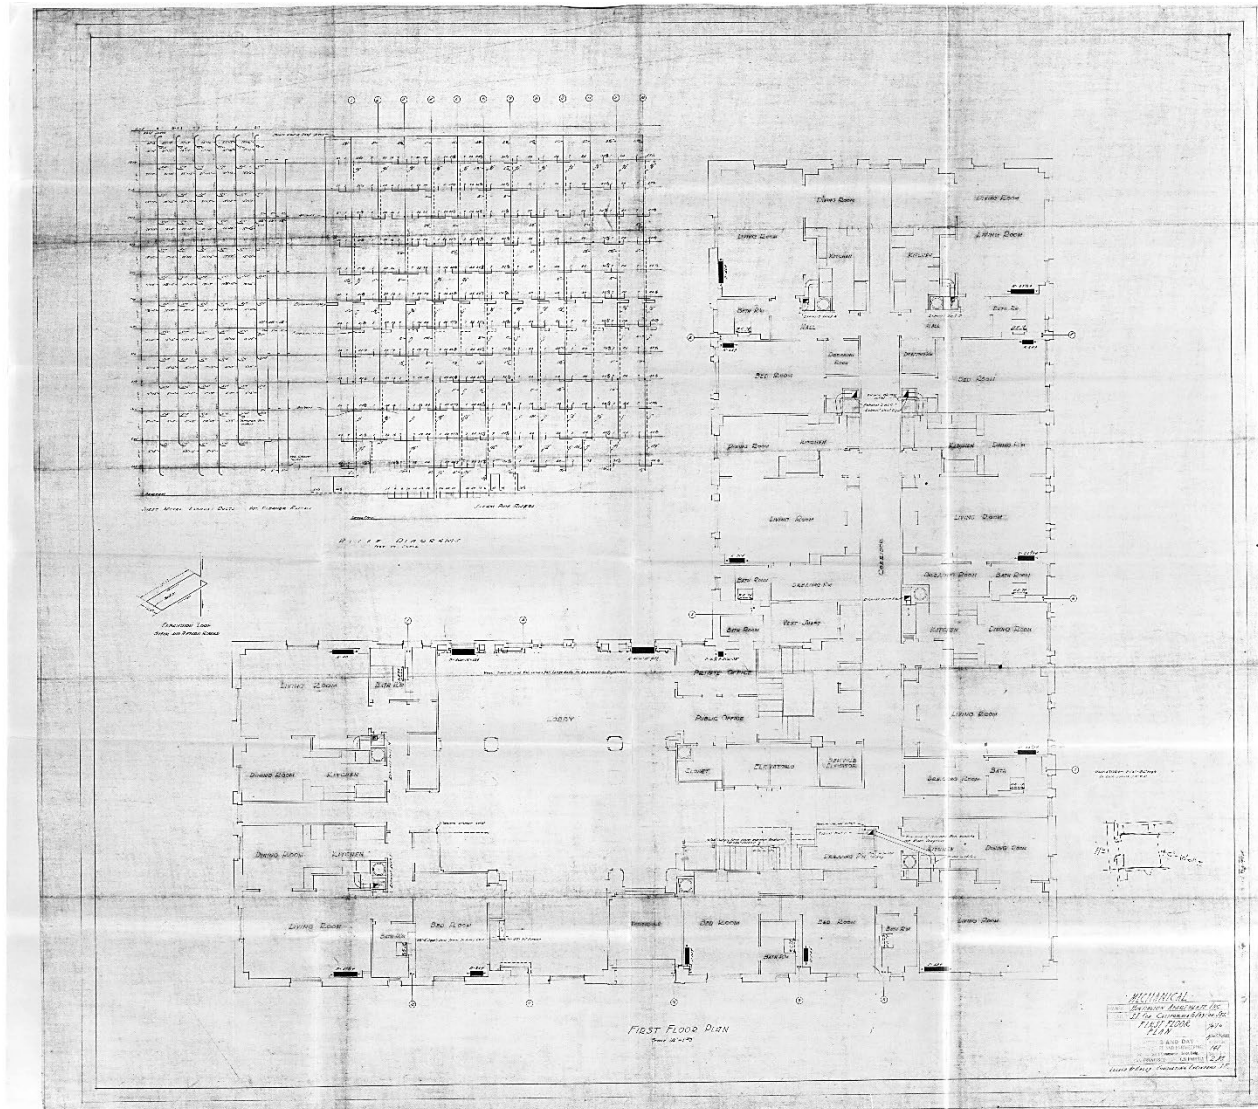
First floor, original plan, showing main entry and lobby, along with elevators and stair.
